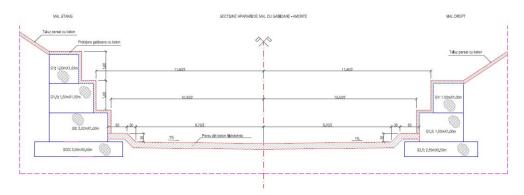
The designed riverbed protection works (upstream side of the bridge)
